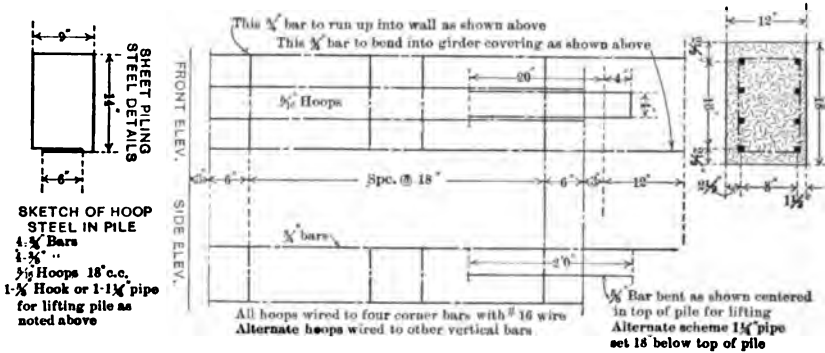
BALTIMORE CONCRETE SHEET PILE.
